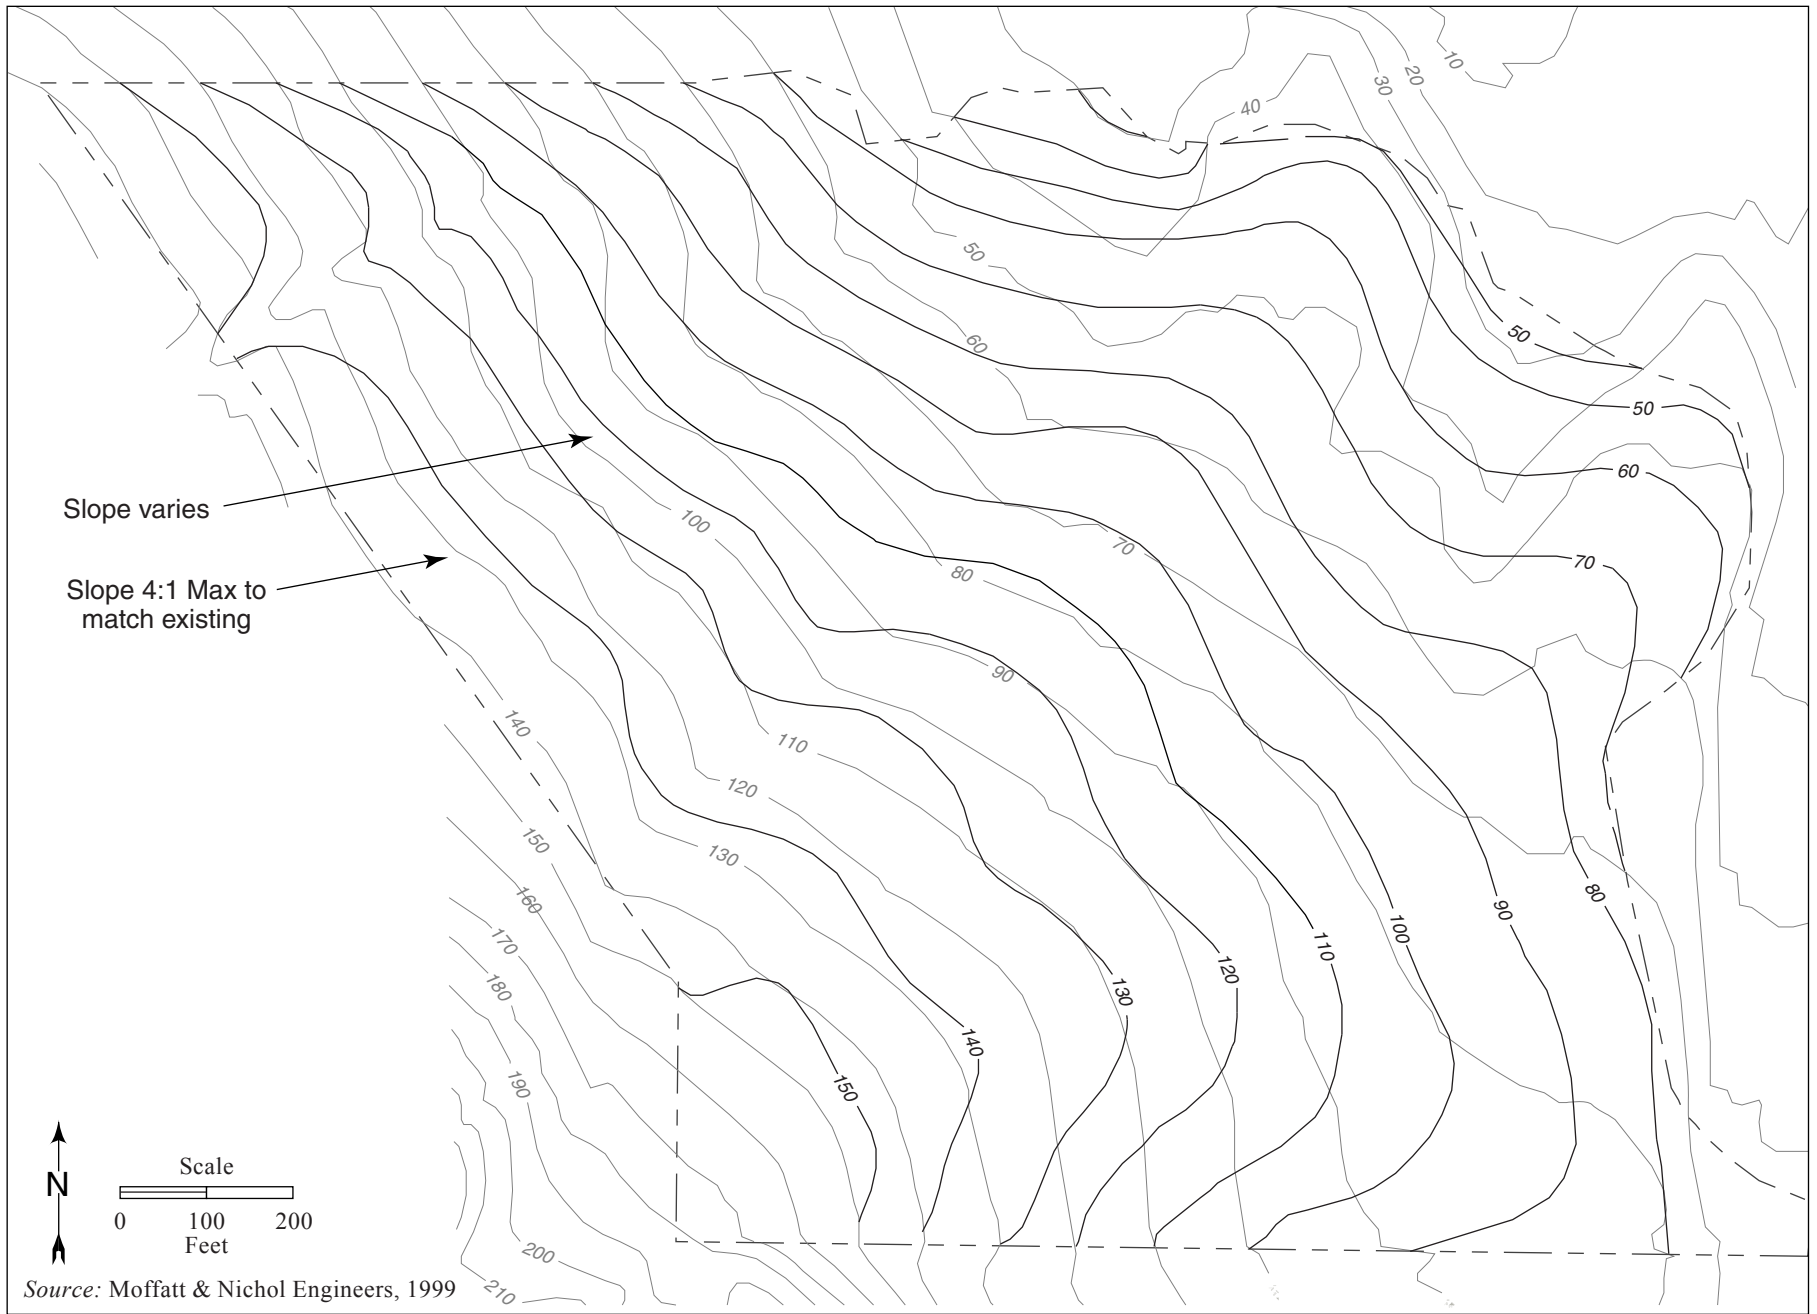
Disposal Site DS36 Grading Plan
